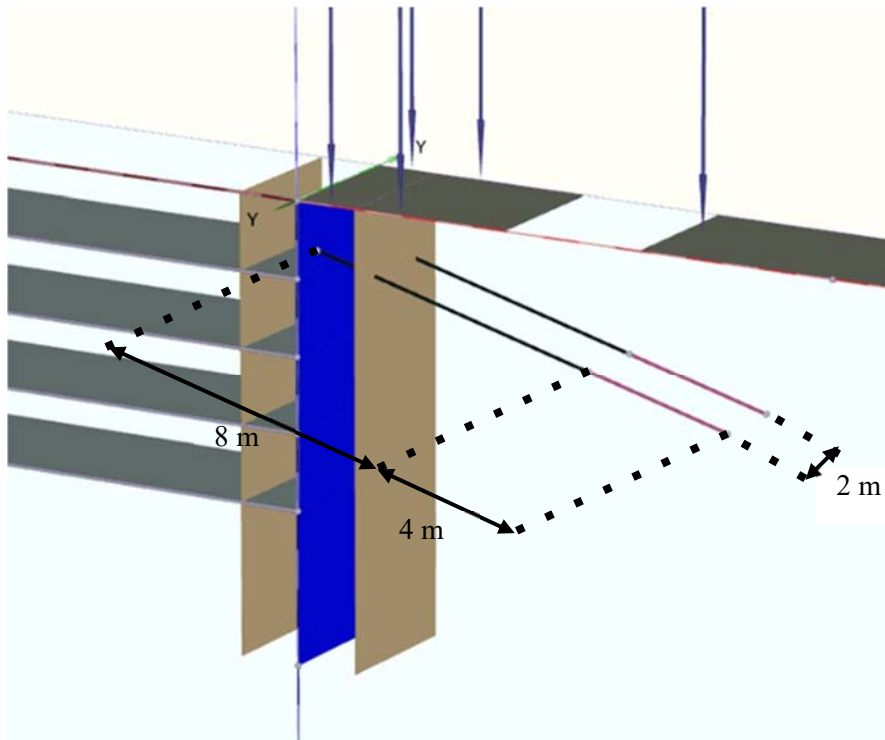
Geometry in 3D (detailed modelling of Embedded Beam Rows)
